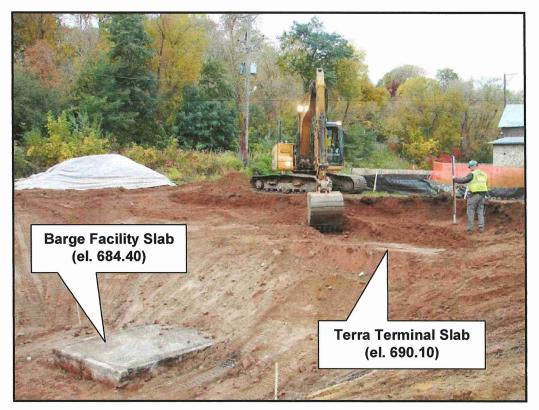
TERRA TERMINAL AND BARGE FACILITY CONCRETE SLABS, VIEW TO NORTHWEST
